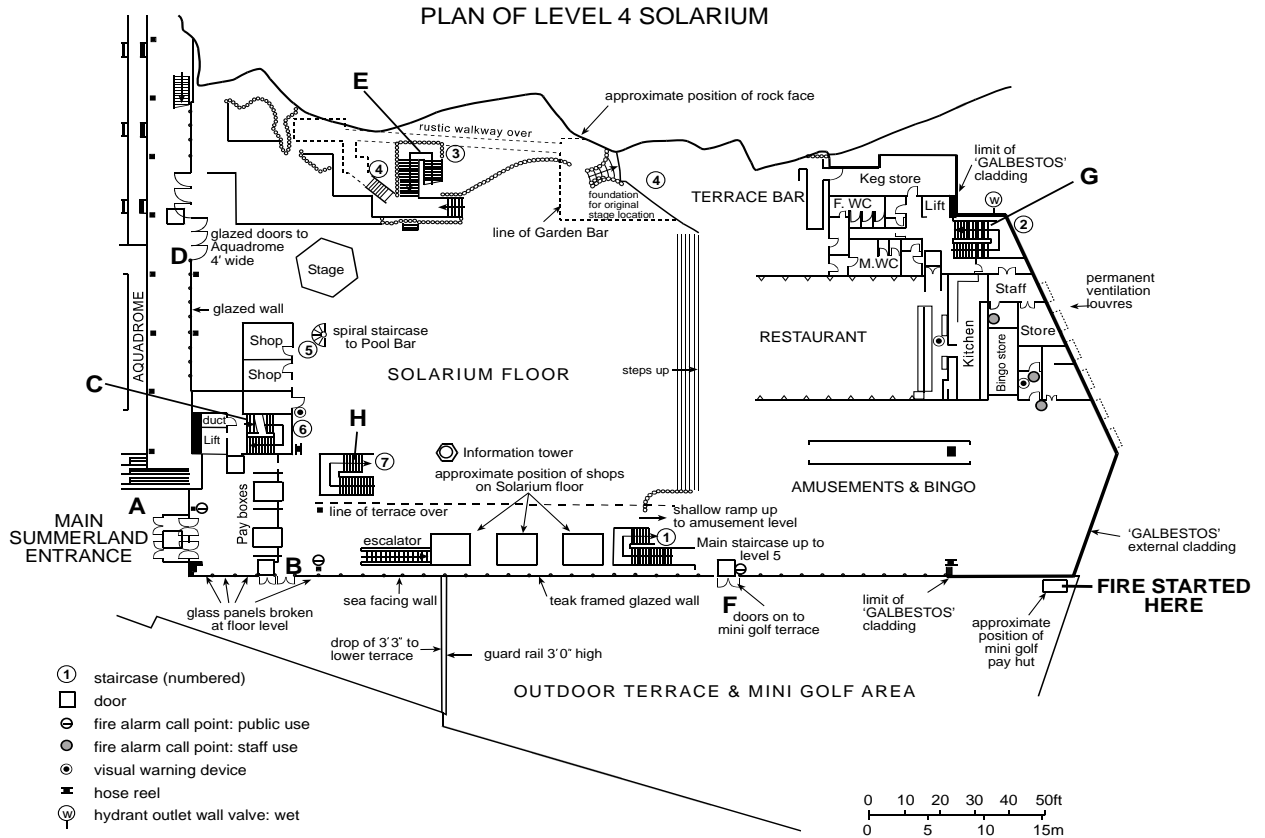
Escape routes (A, B, C, D, E, F, G and H) from the Solarium floor (Level 4). Note how six of the eight exits are at one end of the building
